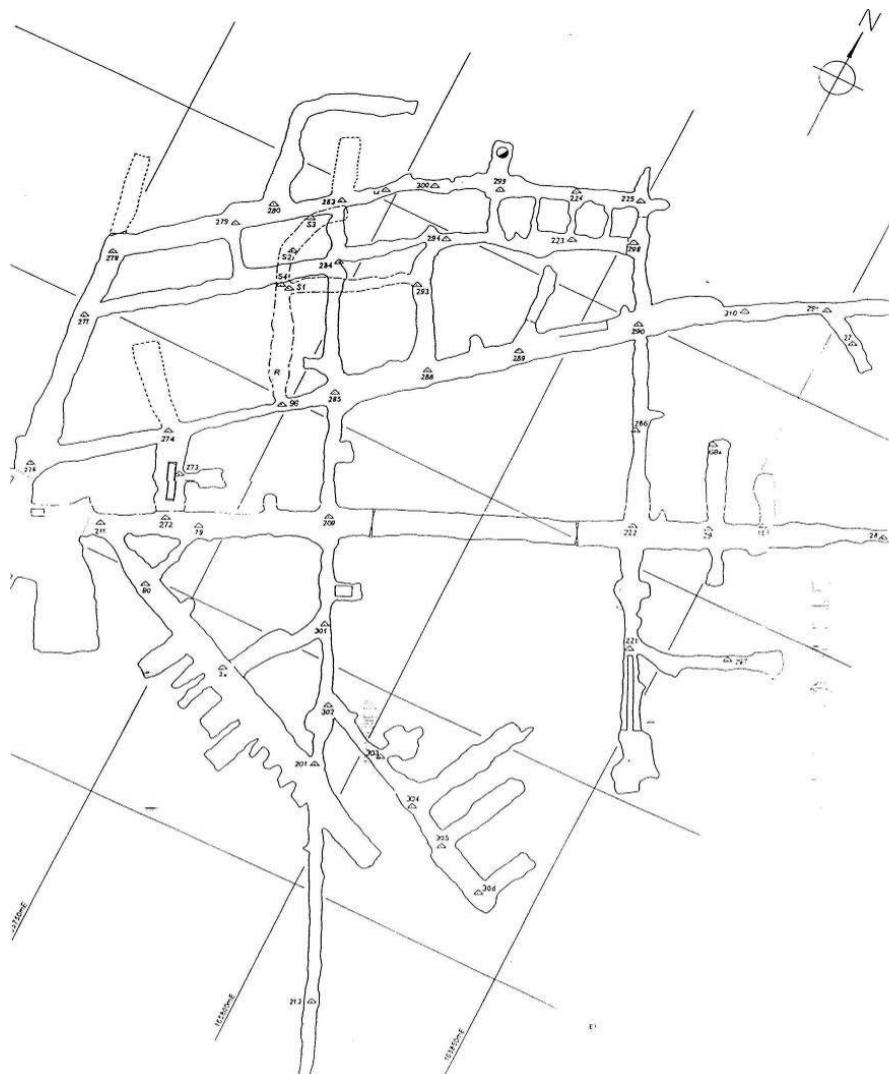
Plan of Tunnels at CSM Test Mine (50m Scale)
